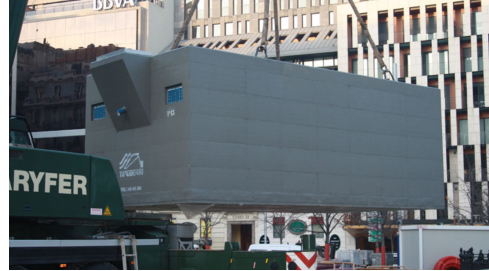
Underground electrical substation. (Source: [elp](#))
